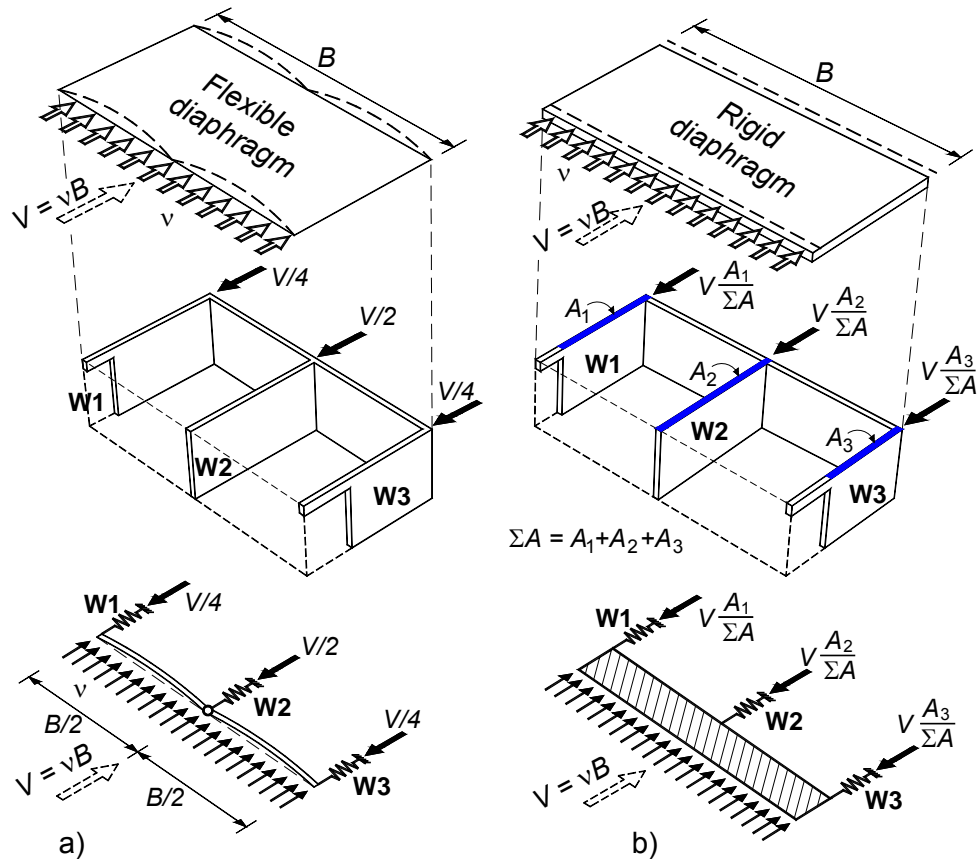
Distribution of lateral loads in buildings: a) flexible, and b) rigid diaphragms.
